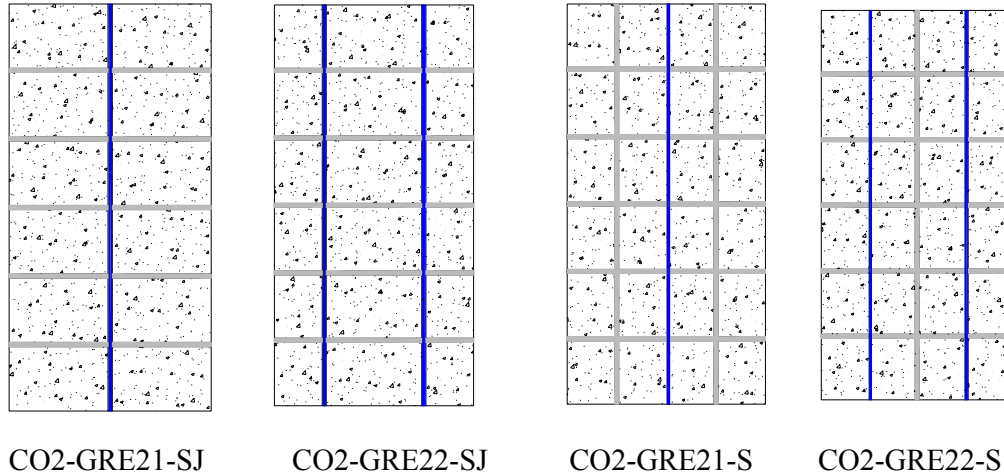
Reinforcement Scheme for Specimens Built with a Stack Pattern Bond Type Having Reinforcement Crossing the Blocks (CO2-GRExy-S), or Placed in the Vertical Joints (CO2-GRExy-S)
